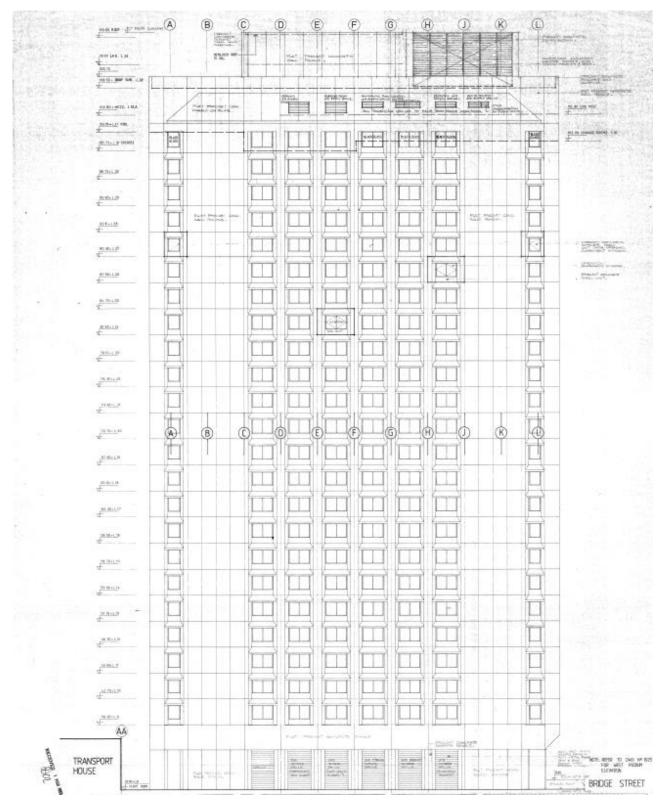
Extract proposed plans from 1983: Tower western elevation Source: Sydney City Council, Stamps DA plans dated 30 September 1983
